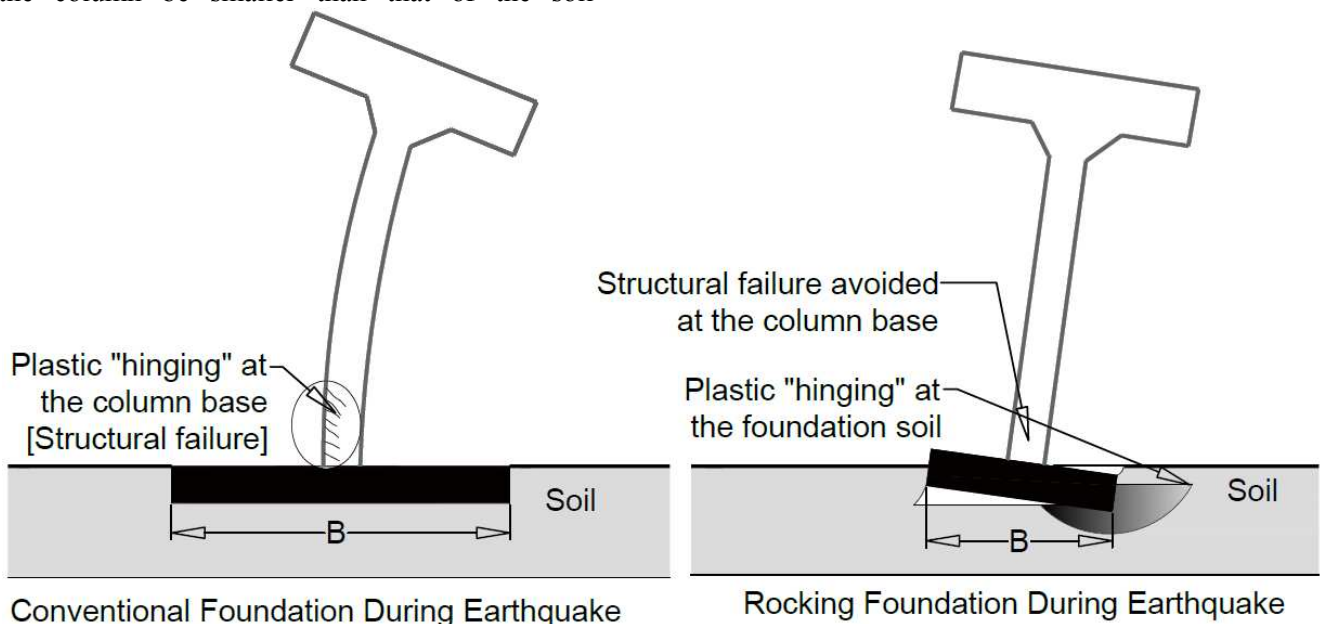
Comparison of conventional shallow foundation with rocking shallow foundation
